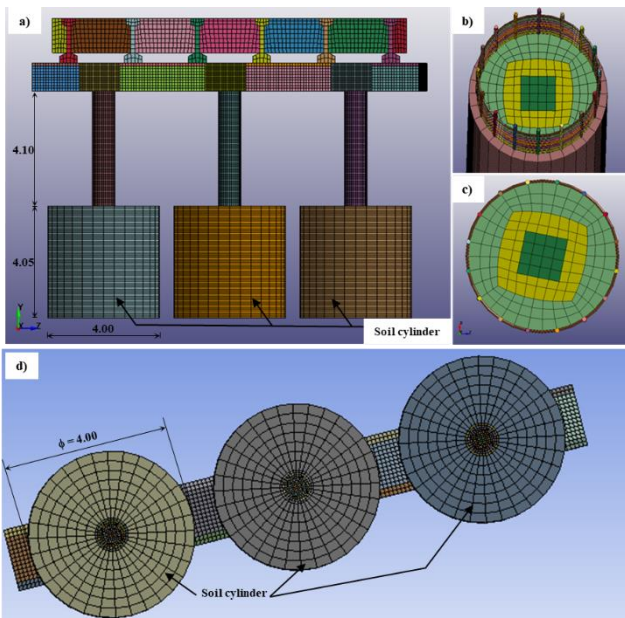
(a) Finite element model; (b) steel rebars; (c) transversal section of the concrete column; (d) view of the soil cylinders. Units in meters
